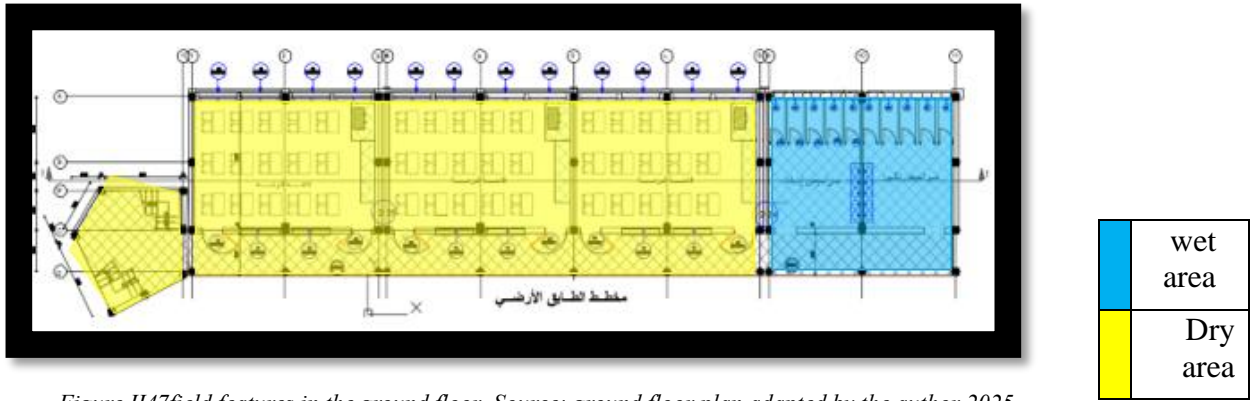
field features in the ground floor ,Source: ground floor plan adapted by the author 2025
